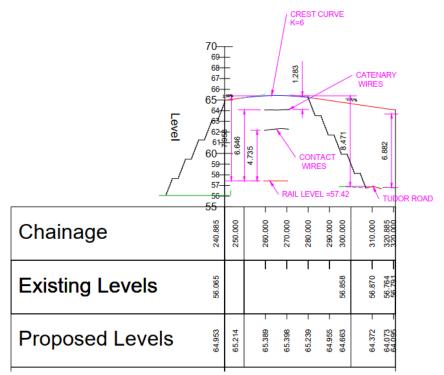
Proposed Structure Plan B Vertical Profile - Walkway
